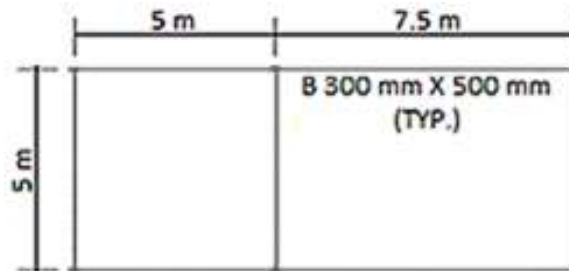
8th and 9th floor plan of the building with vertical irregularity
